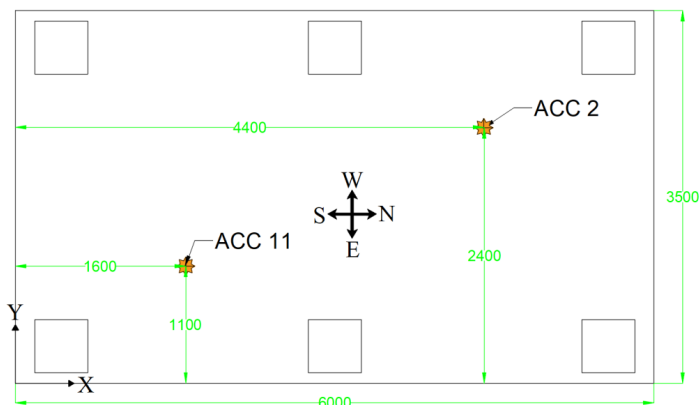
Location of accelerometers underneath the bottom slab (dimensions in mm)
